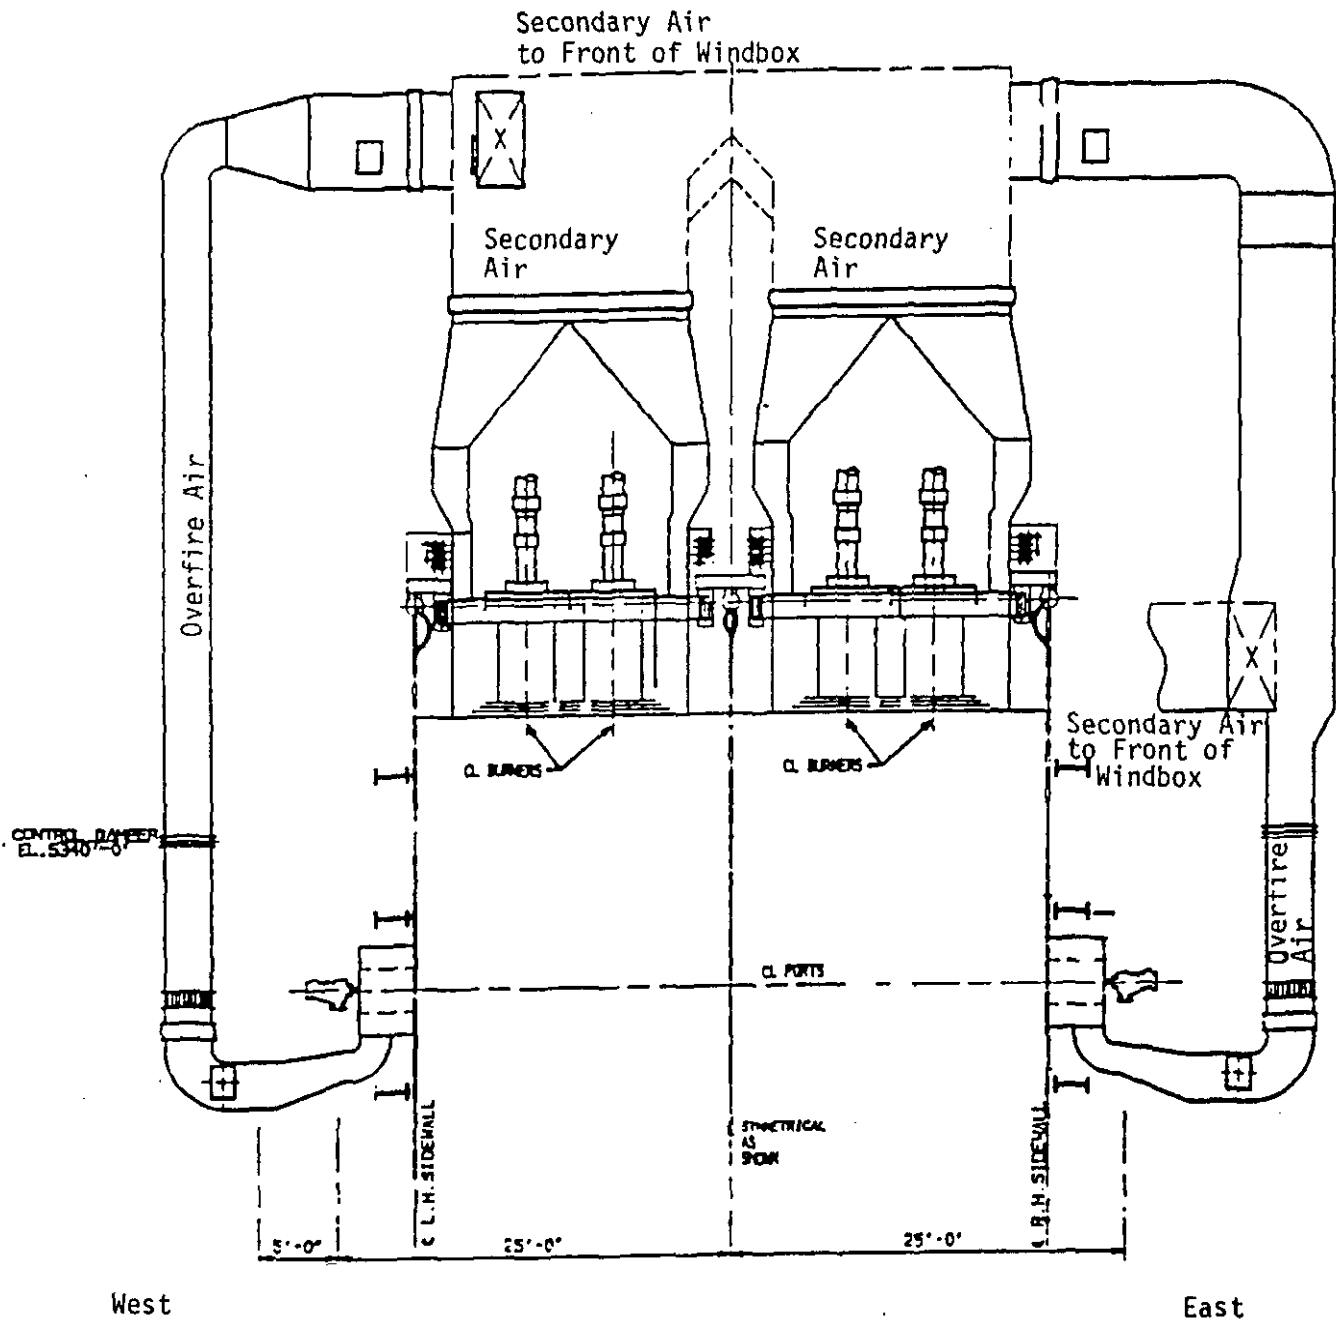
Front Sectional of View of Upper Furnace - Looking North
